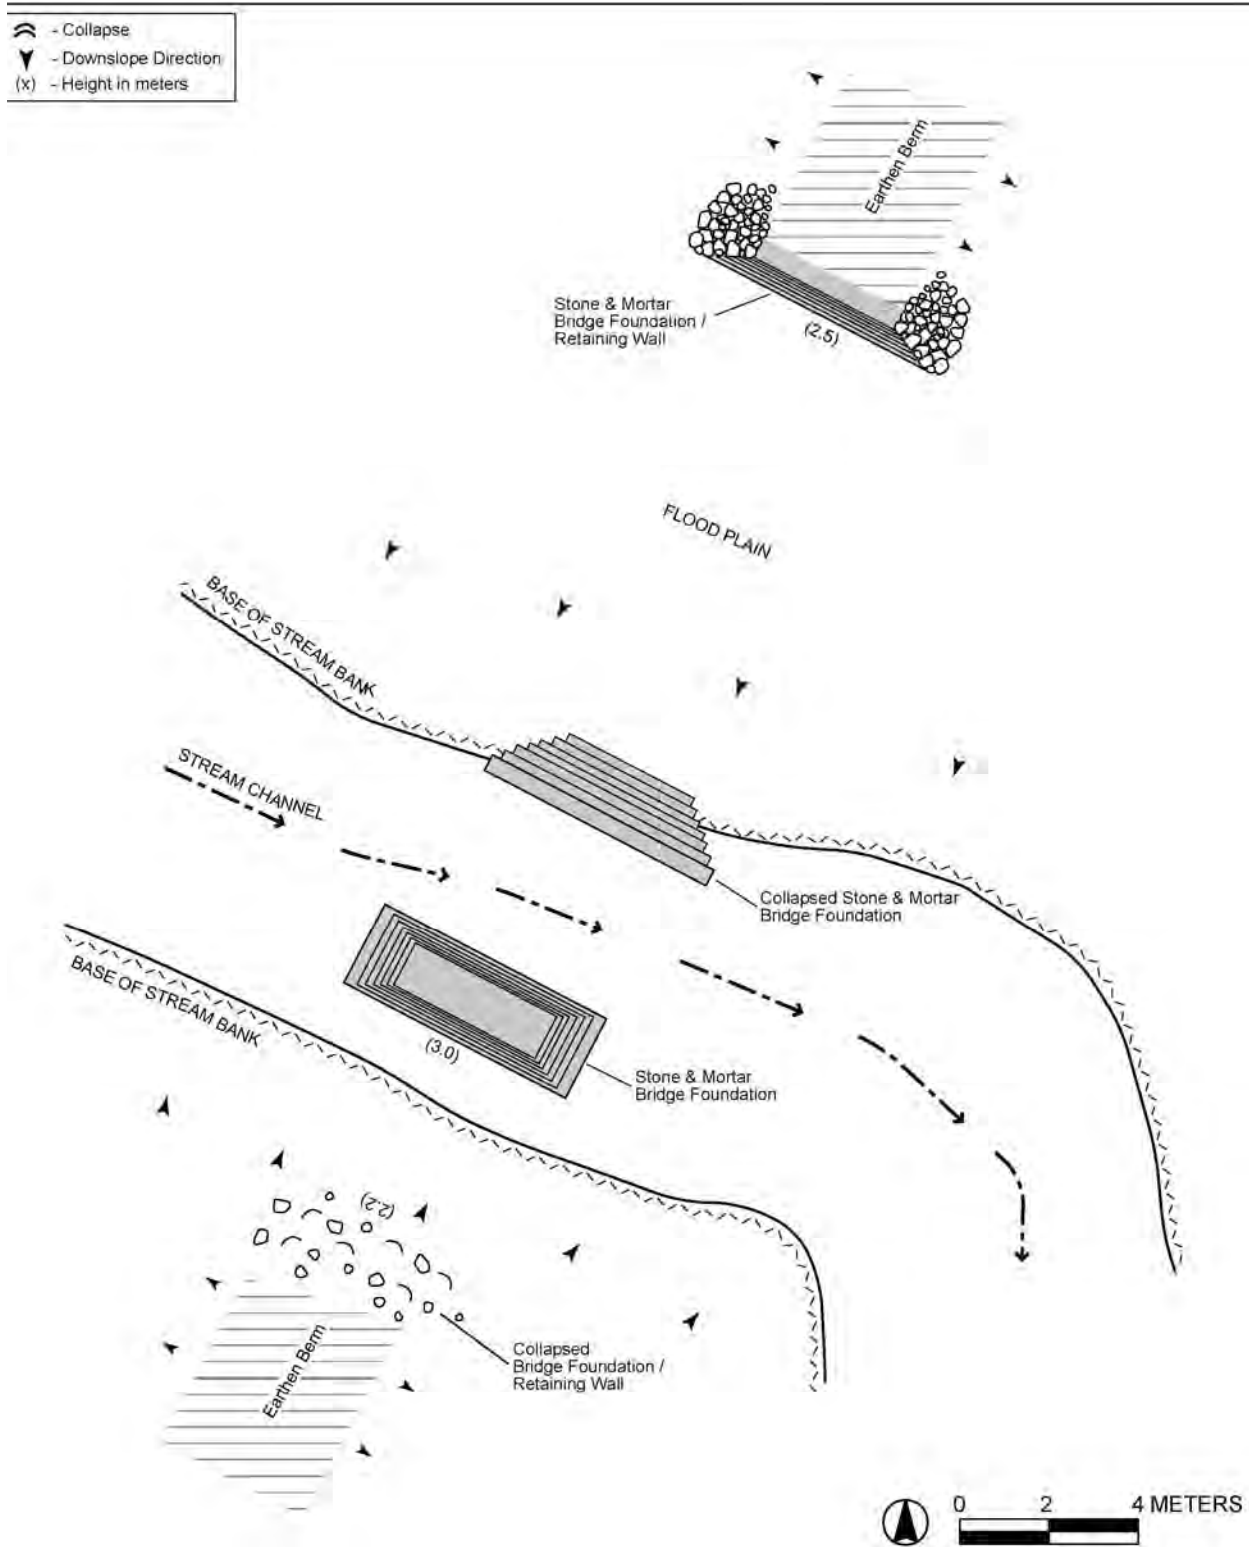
Plan-view diagram of SIHP # 50-80-09-9534 F railroad bridge
